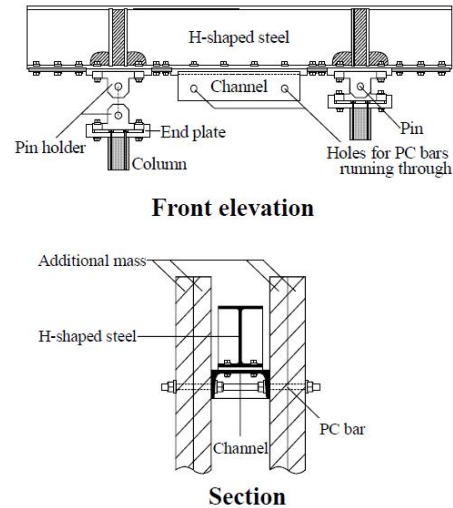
Detailed drawing of connection to specimens of additional mass.
